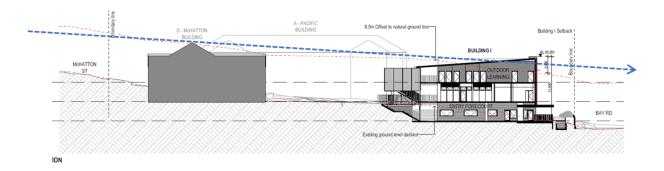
Extract of section depicting sight line from dwellings on McHatton Street (Source: Fulton Trotter)
